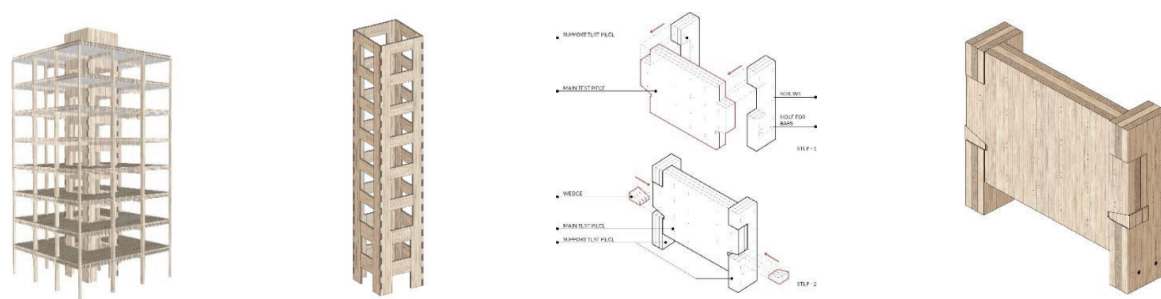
Building core (Left two images) and previous test specimens for potential CLT-LVL core panel corner connections
